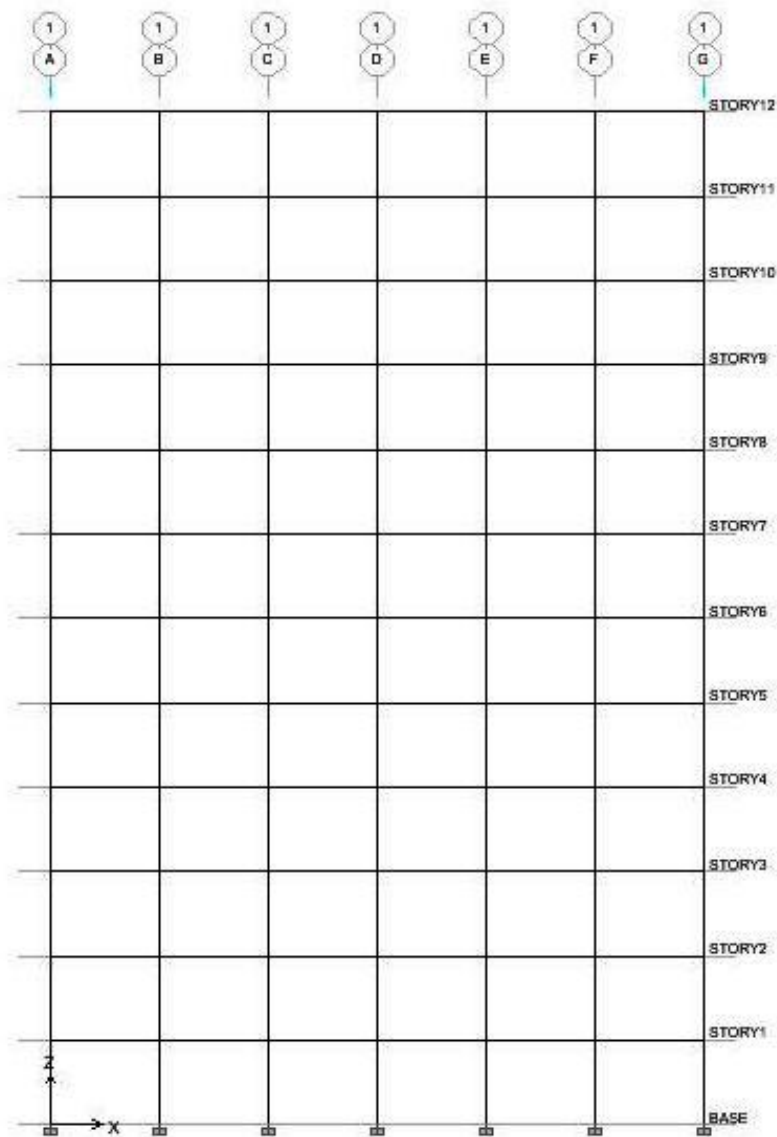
ELEVATION VIEW FOR 12 STOREY R/C FRAME BUILDING
